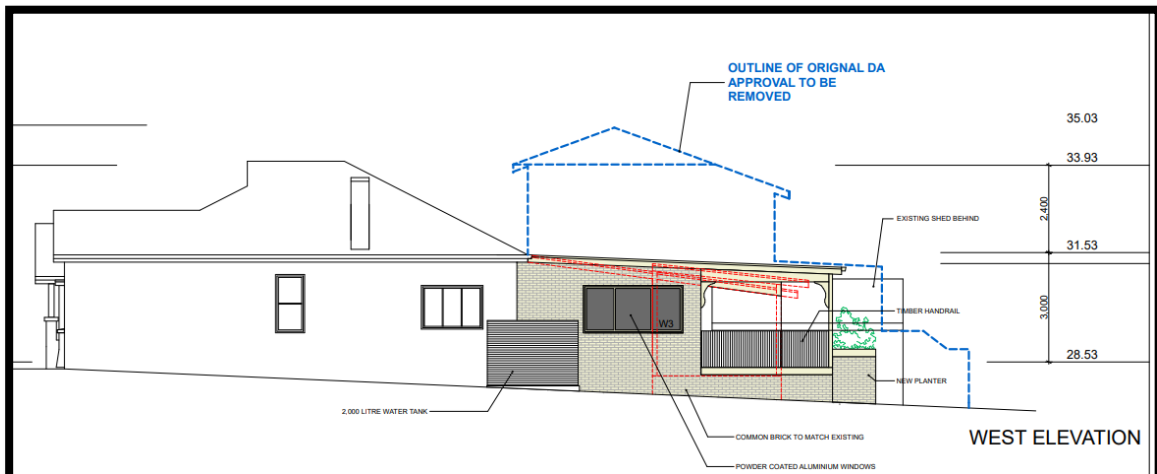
(DA 2018.124.3) - Proposed Modification to the West Elevation
